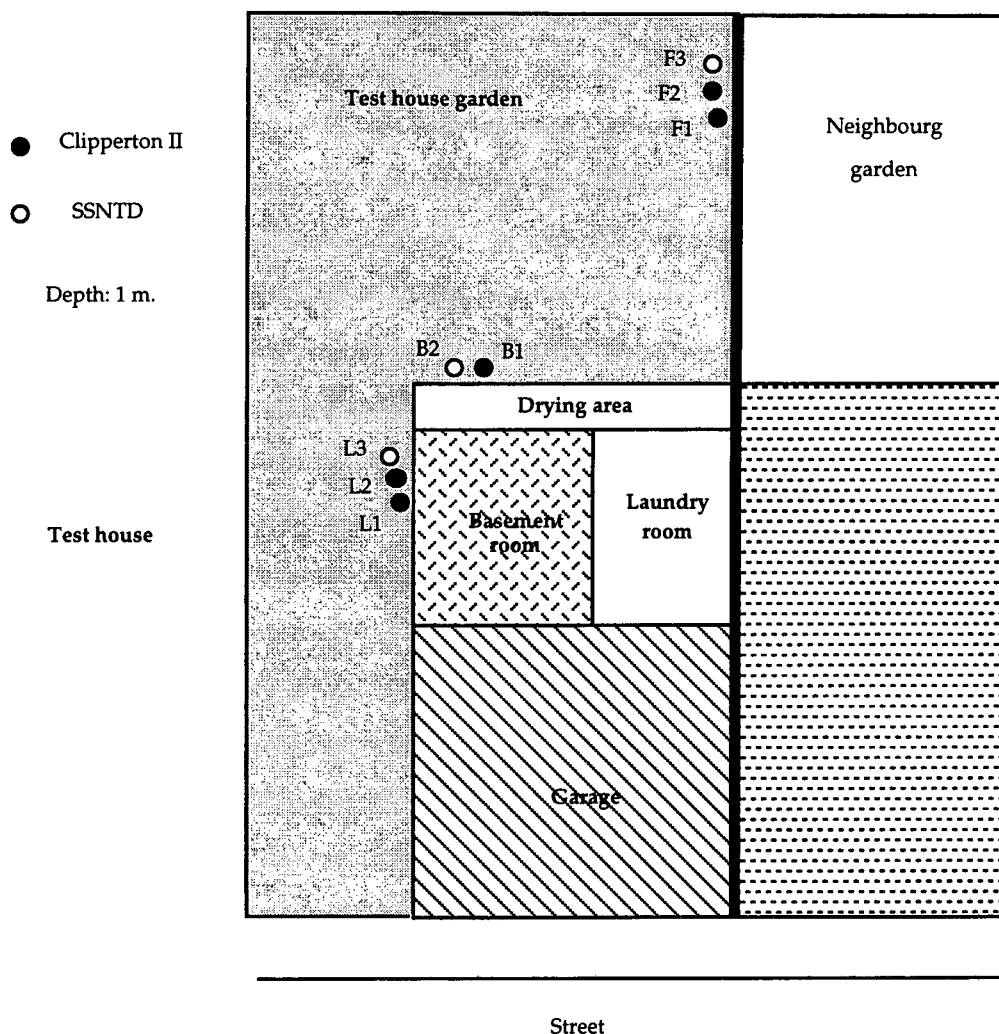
Distribution of soil radon detectors in the test house garden (top view). The rooms of the test house are those placed at the basement level.
